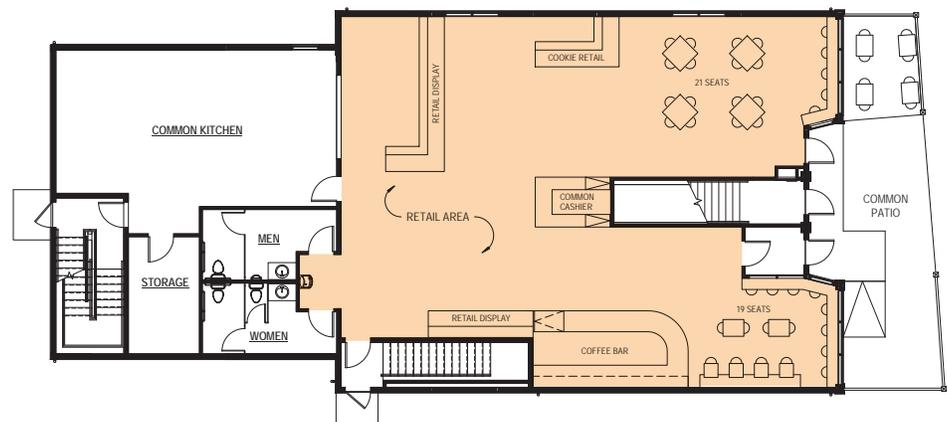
First floor plan. Retail and dining are highlighted in orange.
